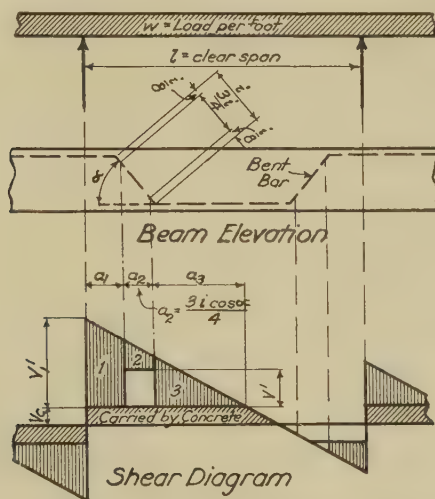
BENT-UP BARS IN CONJUNCTION WITH STIRRUPS.
